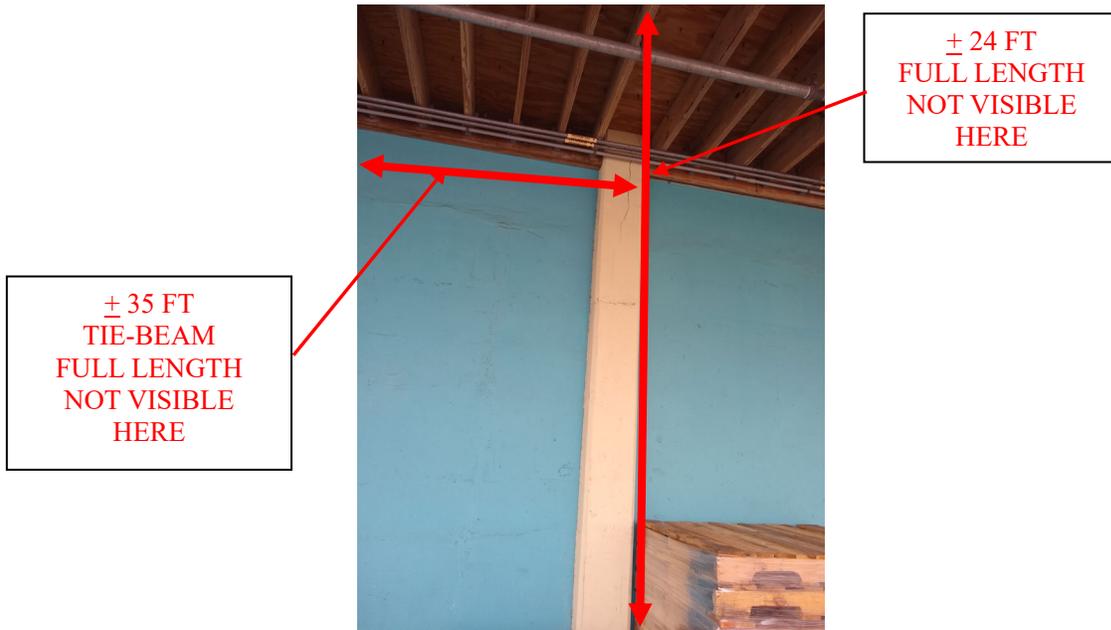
Location 15: Approximately 24 ft long new 12x12 concrete column. See detail 2/S102. Approximately 35 ft long new tie-beam. See detail 4/S103.
